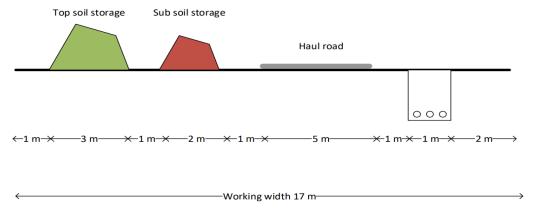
Working Corridor for Cables (source: WSP | not to scale)
